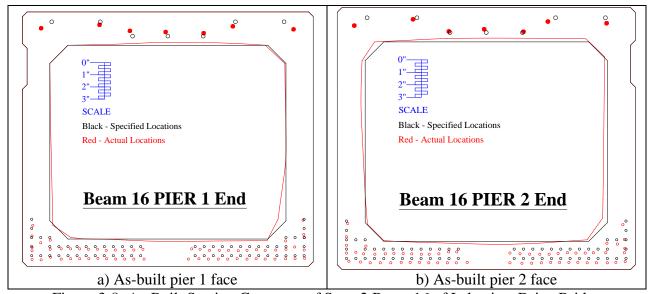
As-Built Section Geometry of Span 2 Beam 16 of Lakeview Drive Bridge
